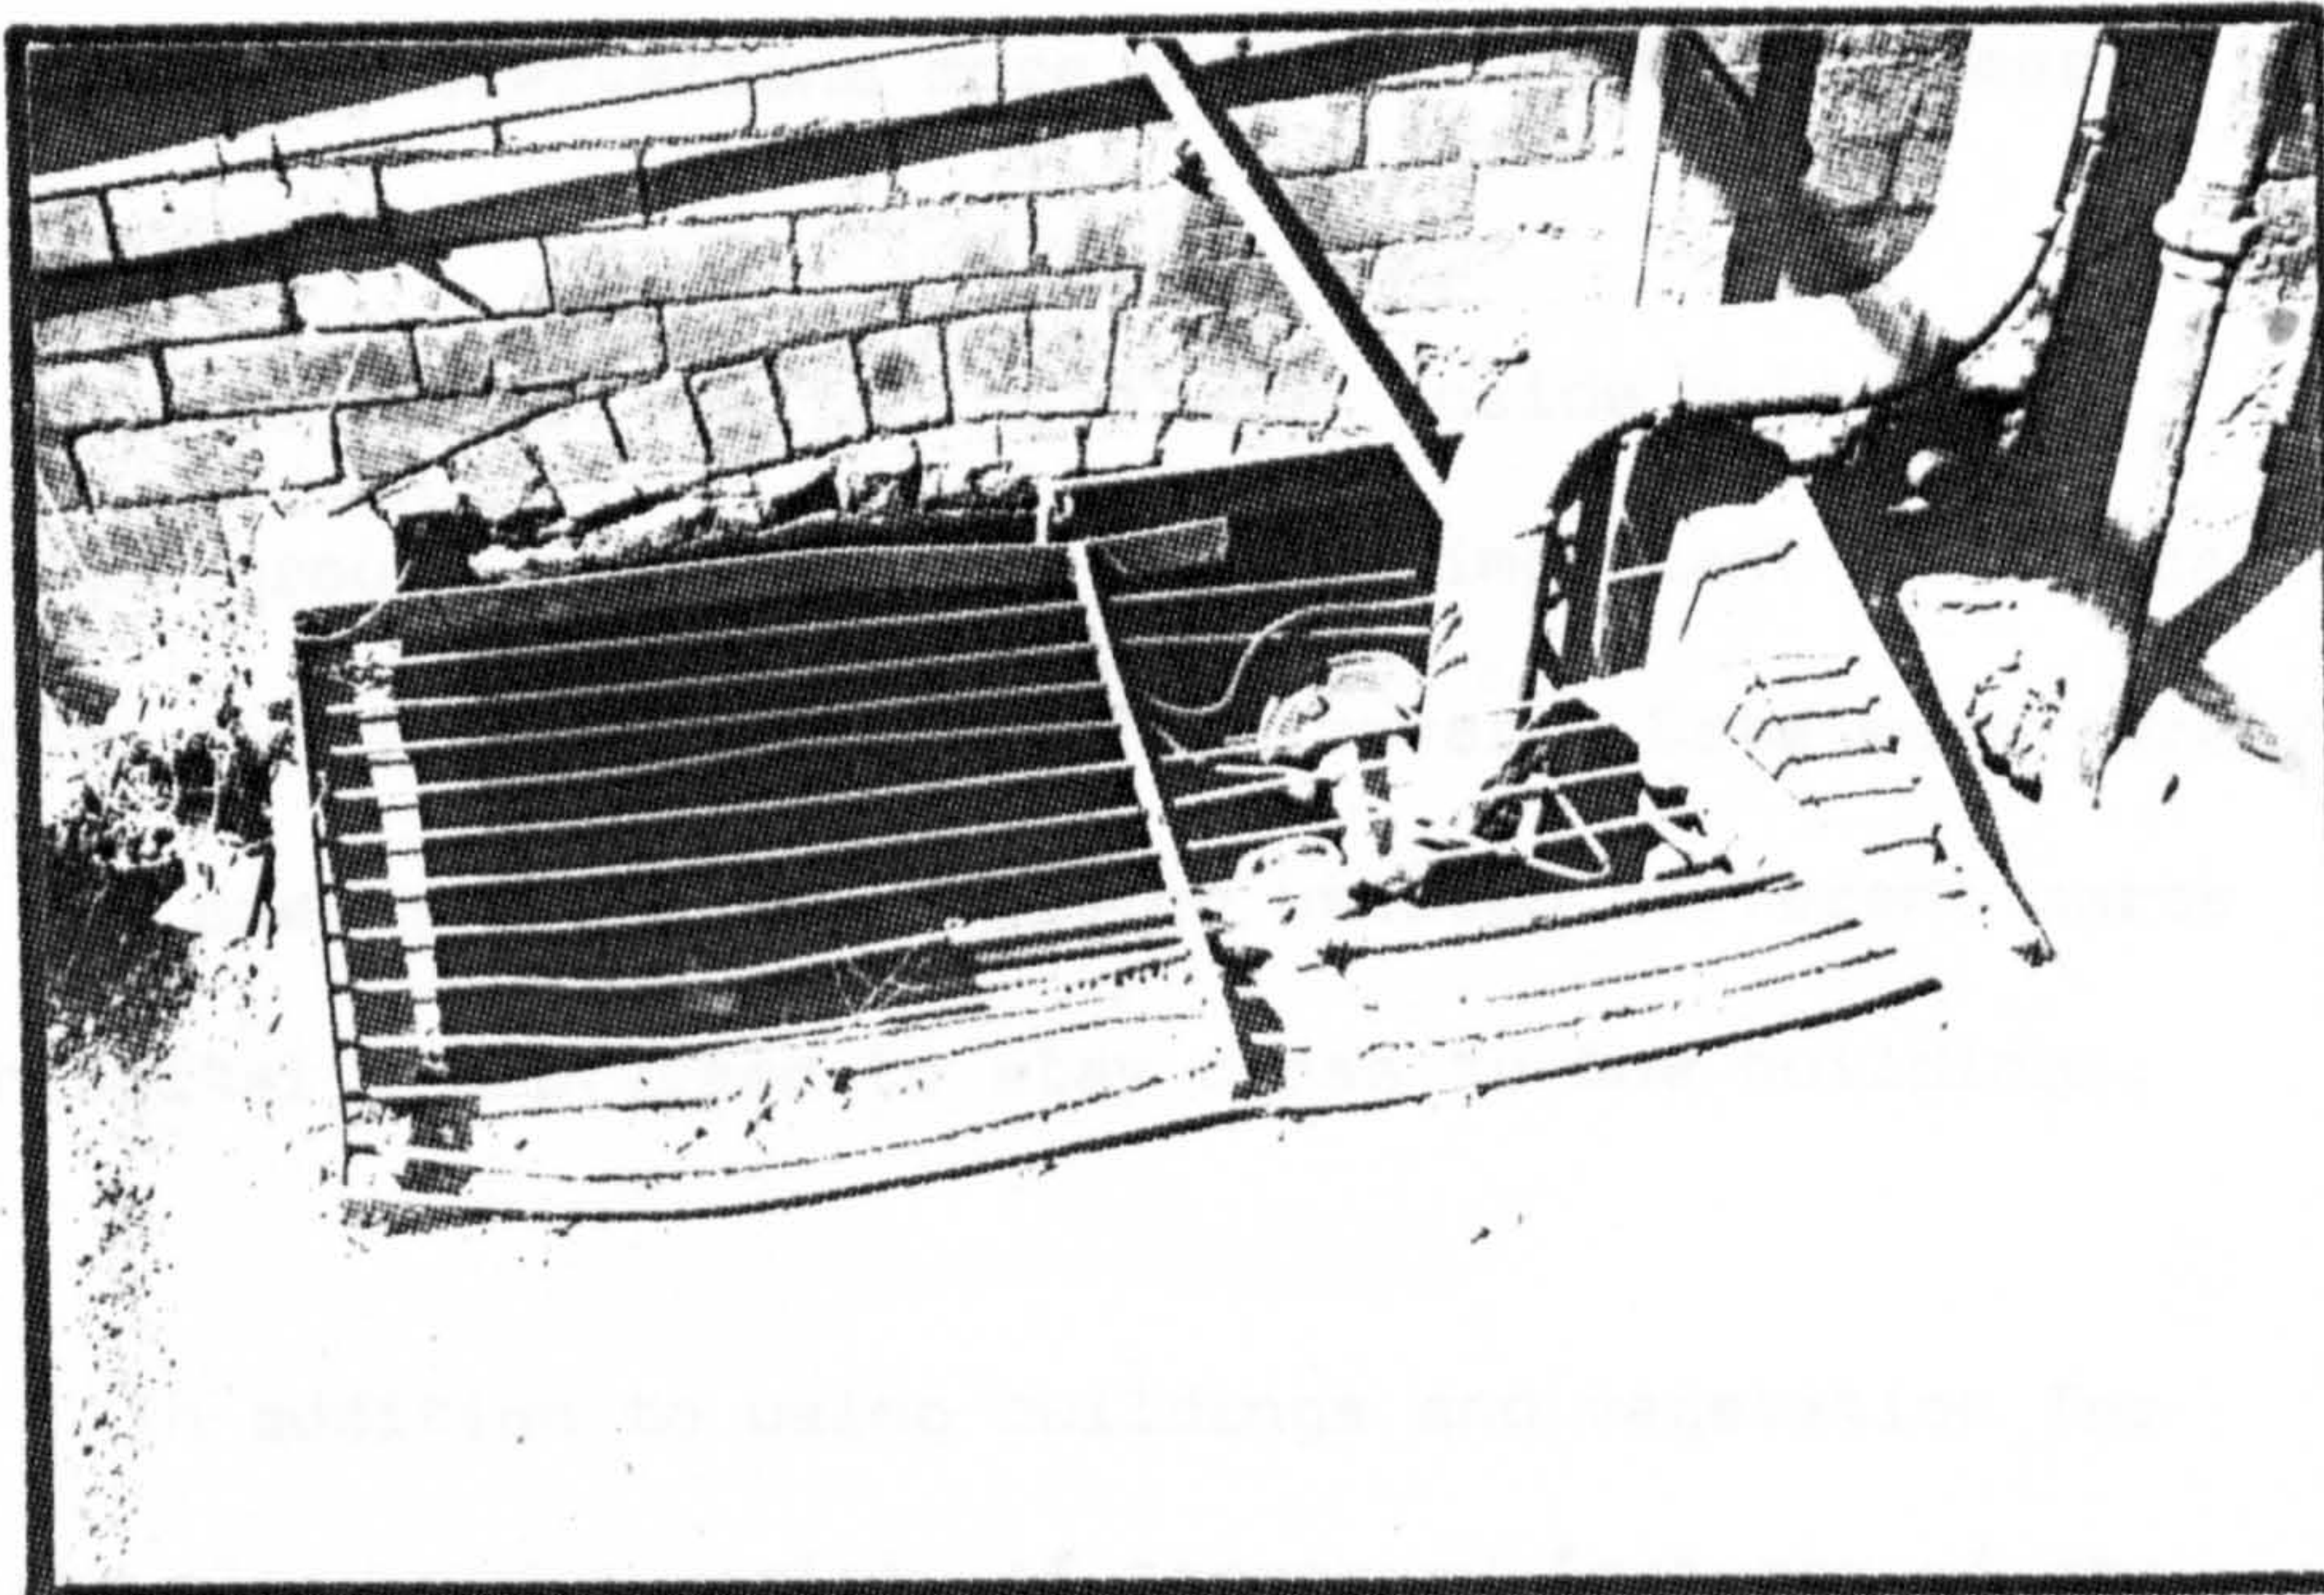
Ventilation grid providing access to the basement of the boiler house in zone F. Cats were seen walking along the pipes here in order to enter the underground duct system.
